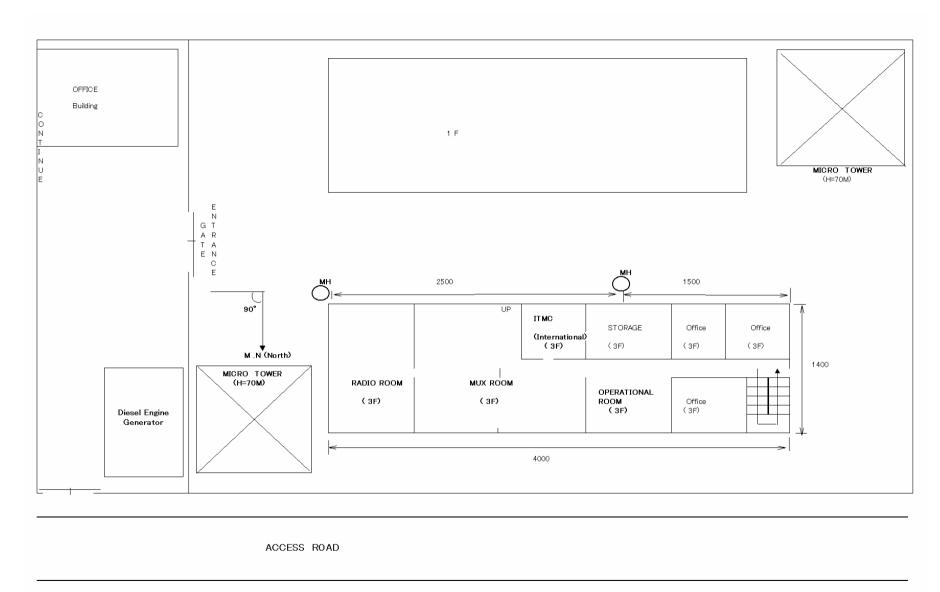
(1/3) Addis Ababa IR/ITE Center Building Layout (3F)
